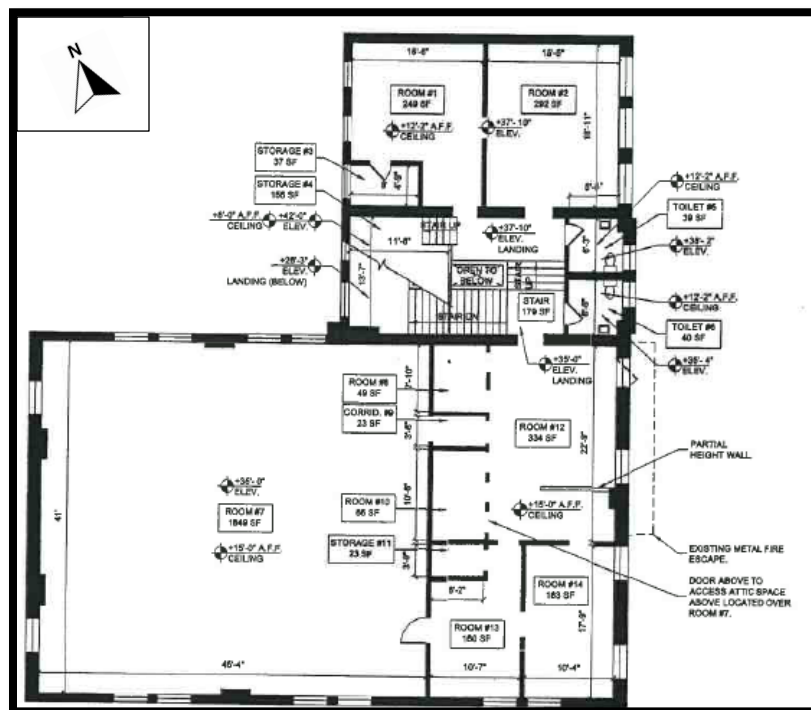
635 6<sup>th</sup> Avenue, City Hall, Fourth Floor
